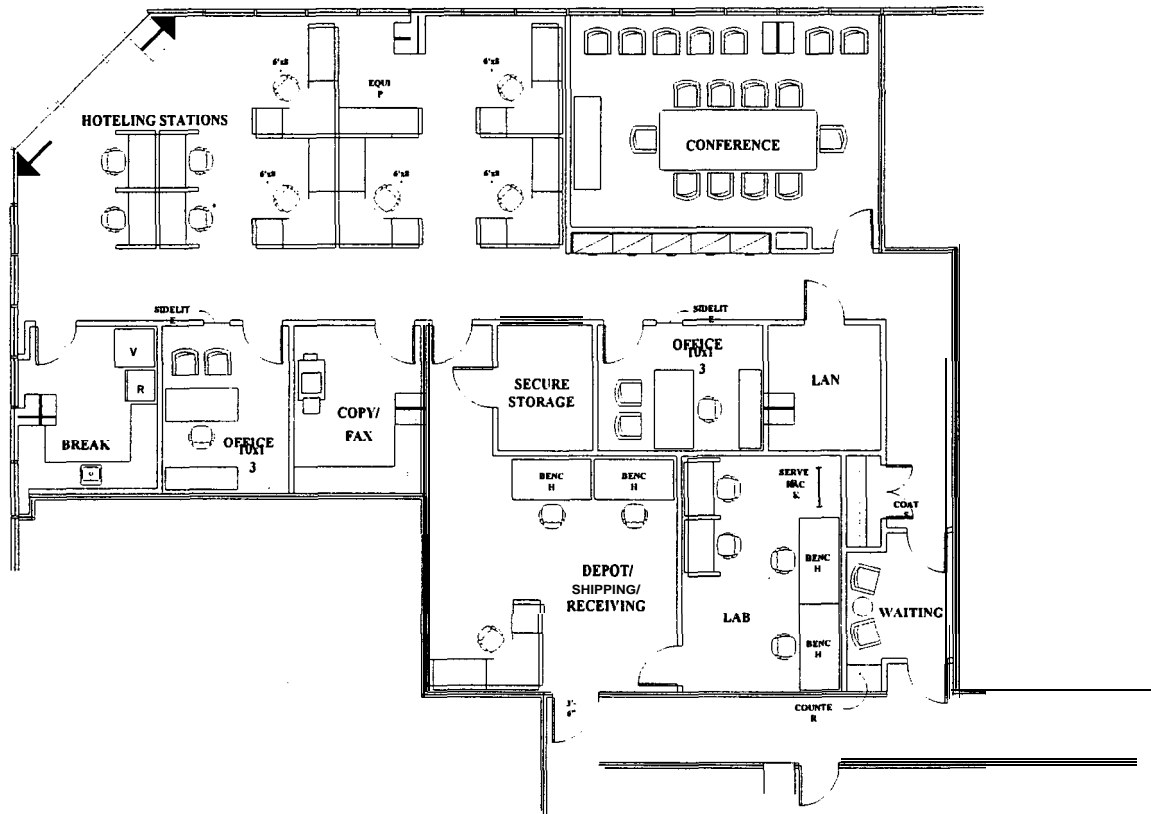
GECITS Rancho Cordova Facility Floor Plan
